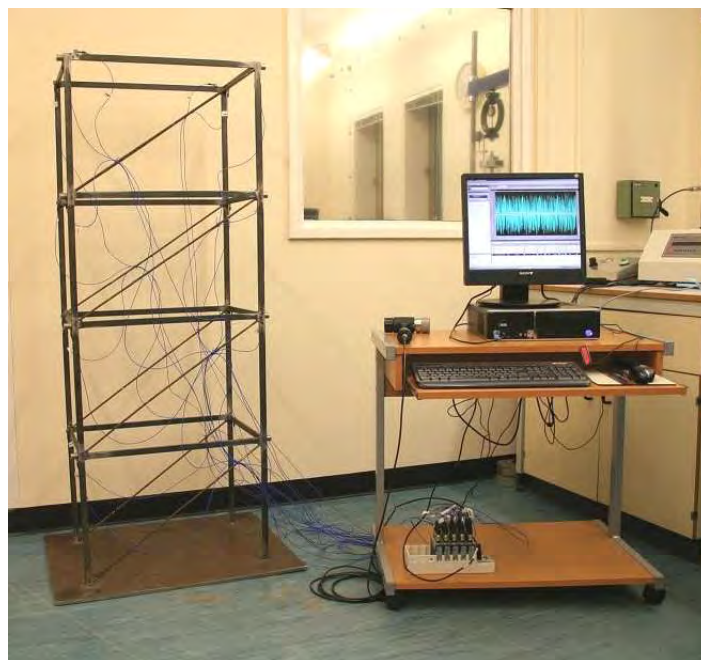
Steel frame model structure used for laboratory testing with installed sensors.
